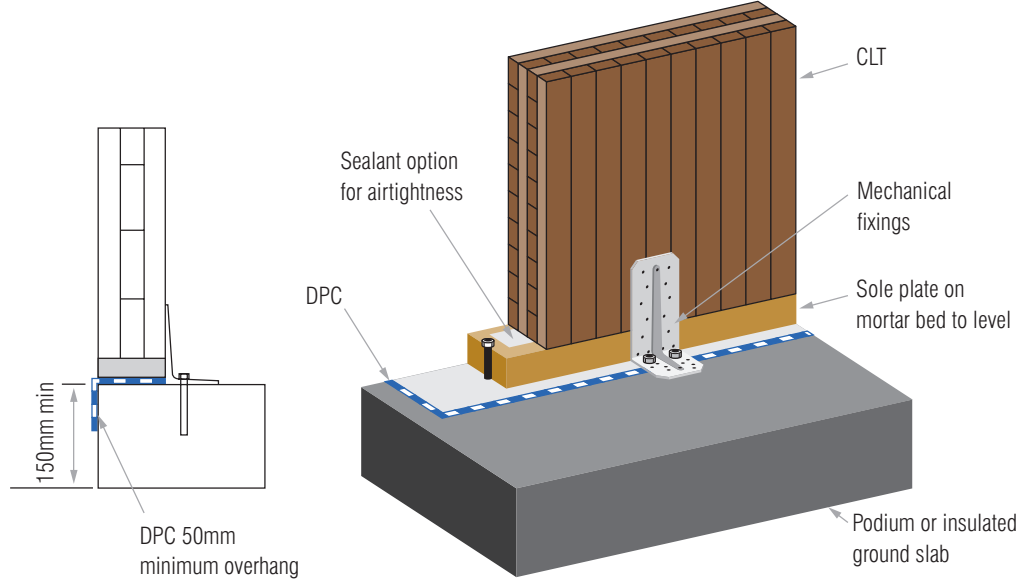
Recommended external wall detail (typical CLT wall to substructure interface)
